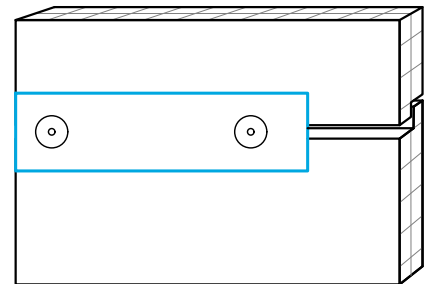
FASTENING @ BOARD JOINT | ISOMETRIC
